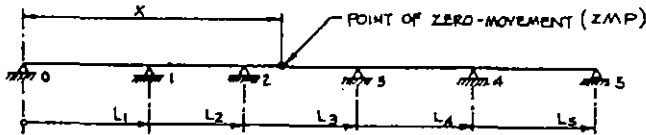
Continuous-Beam bridge deck showing point of zero longitudinal movement
